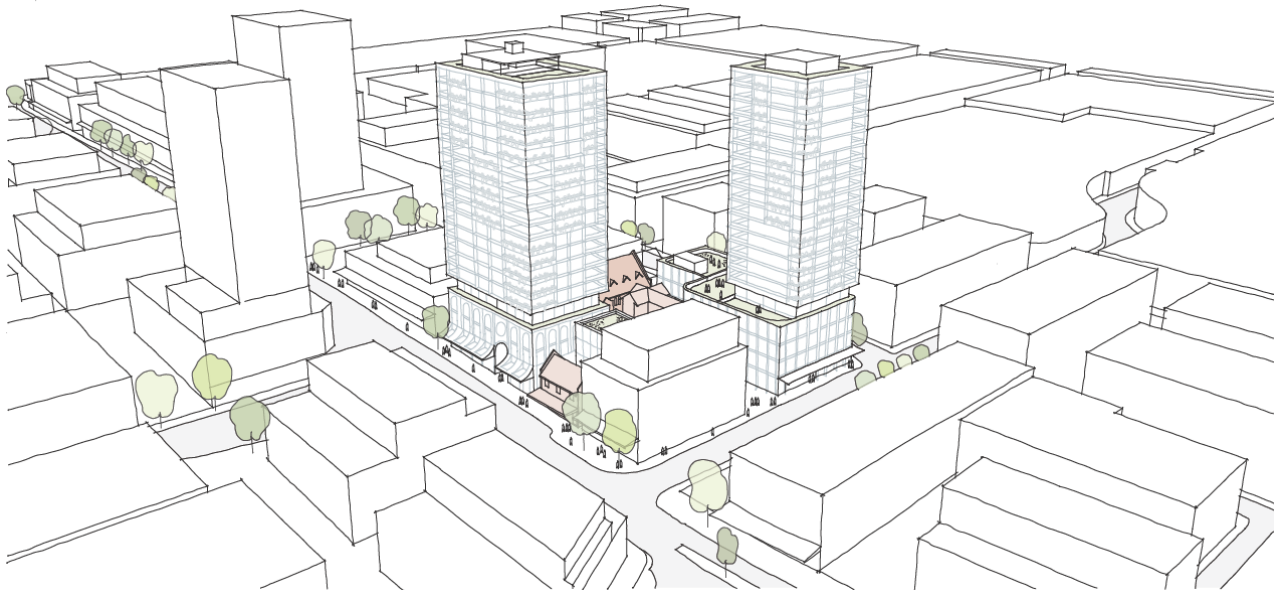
Proponent's Proposed indicative built form, looking from the northern end of Great North Road (note: the towers shown outside of the subject site are not permissible under Council's current controls, nor are they consistent with Council's adopted Local Study for Five Dock).
